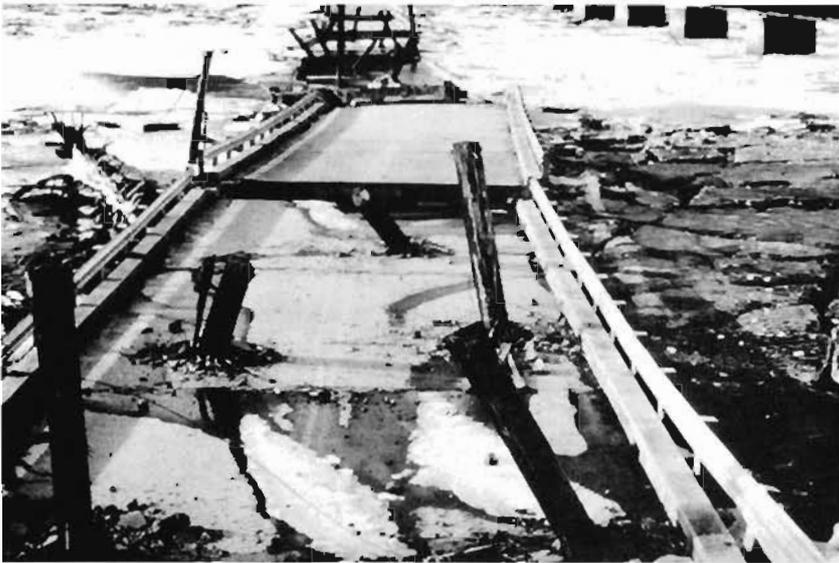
The Twentymile River Bridge was one of several that collapsed during the 1964 Alaska earthquake. Spans of this 825-foot concrete girder bridge fell off their timber pile bents into the water
